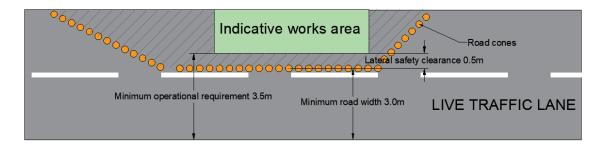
Indicative road works layout, demonstrating minimum operational requirements
